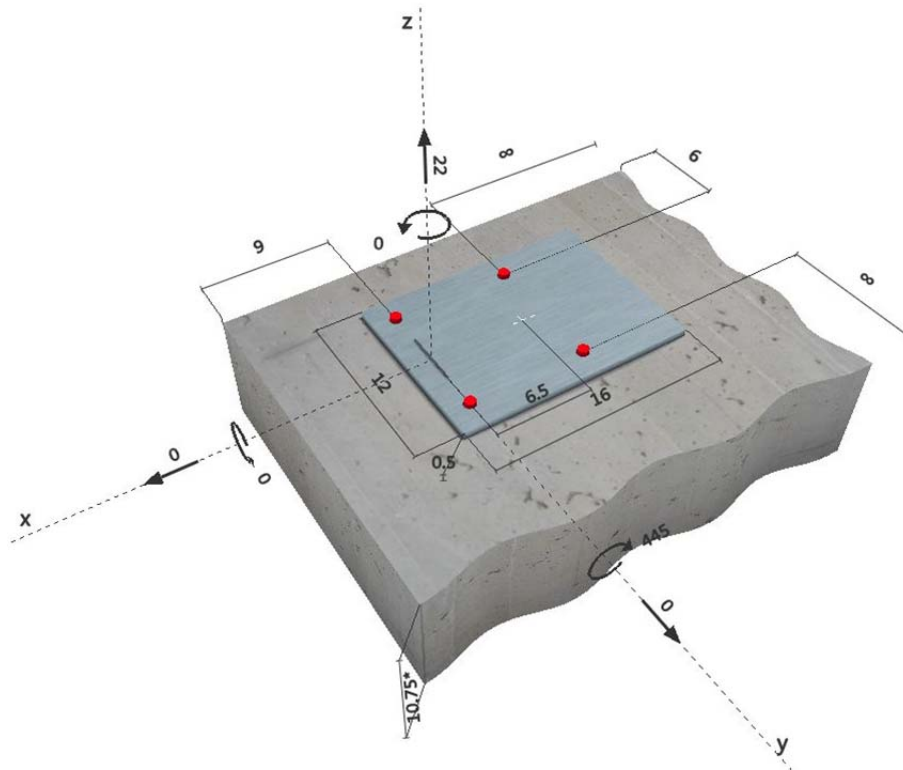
Blunt-End Parapet Retrofit – Base Plate Model
